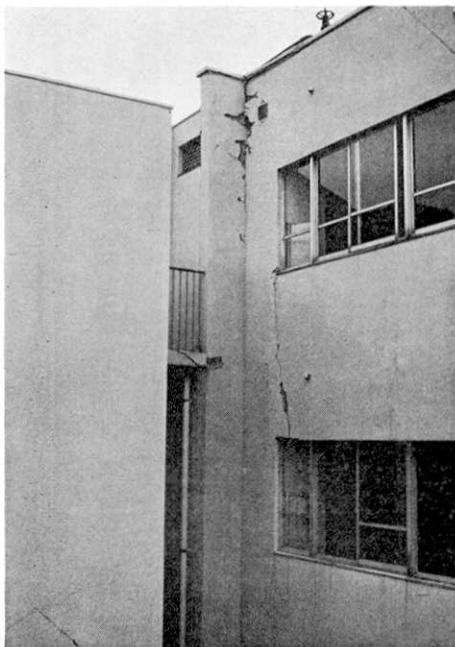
Shear fracture of non-structural wall (Futo Elementary School)
